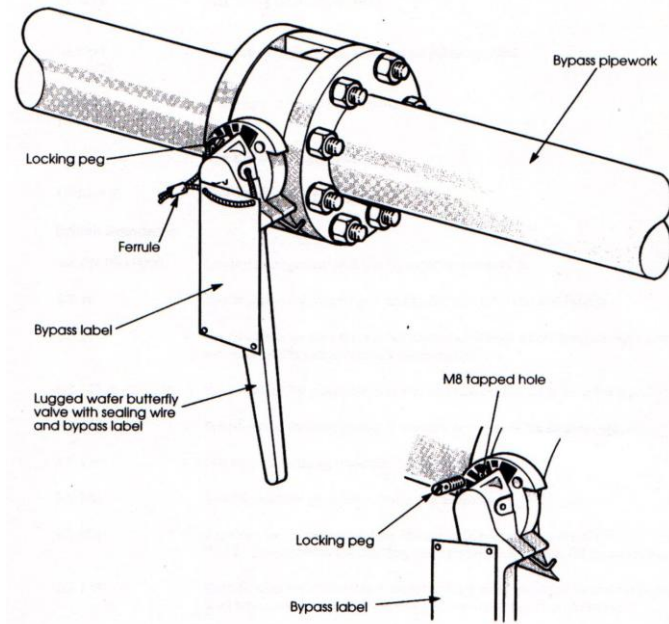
Example of the sealing ferrule and smooth wire sealing method on a butterfly meter by-pass valve.
